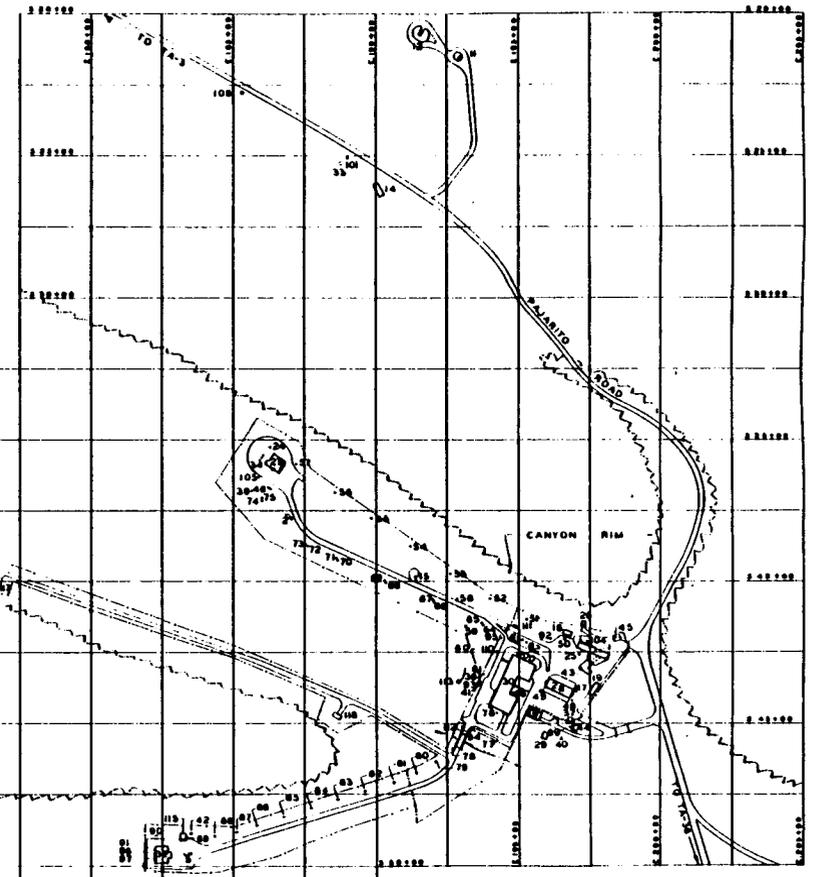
Structure Location Plan for TA-18 - Pajarito Site (1957 Drawing from the LANL Technical Area Structure Location Plans)
